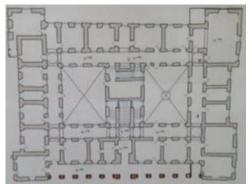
Serah Building Plan (Archives of Sulaimanyah serah)
